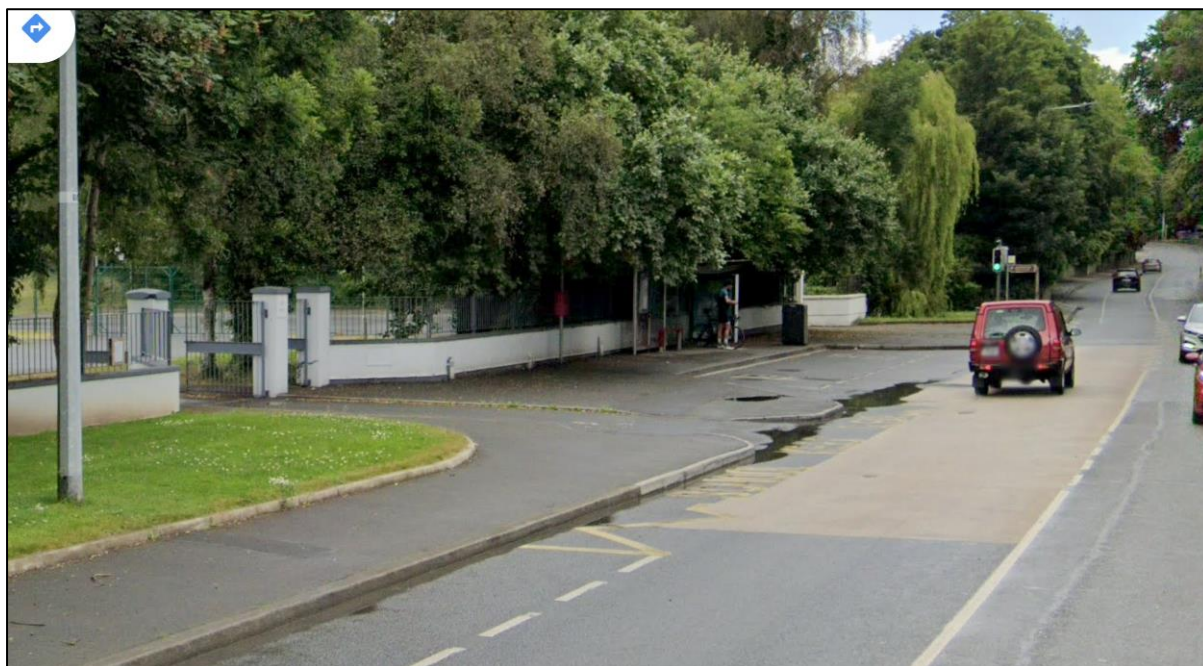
Existing street view at Dublin Road (North end Woodbrook college) (Image Source: Google)
